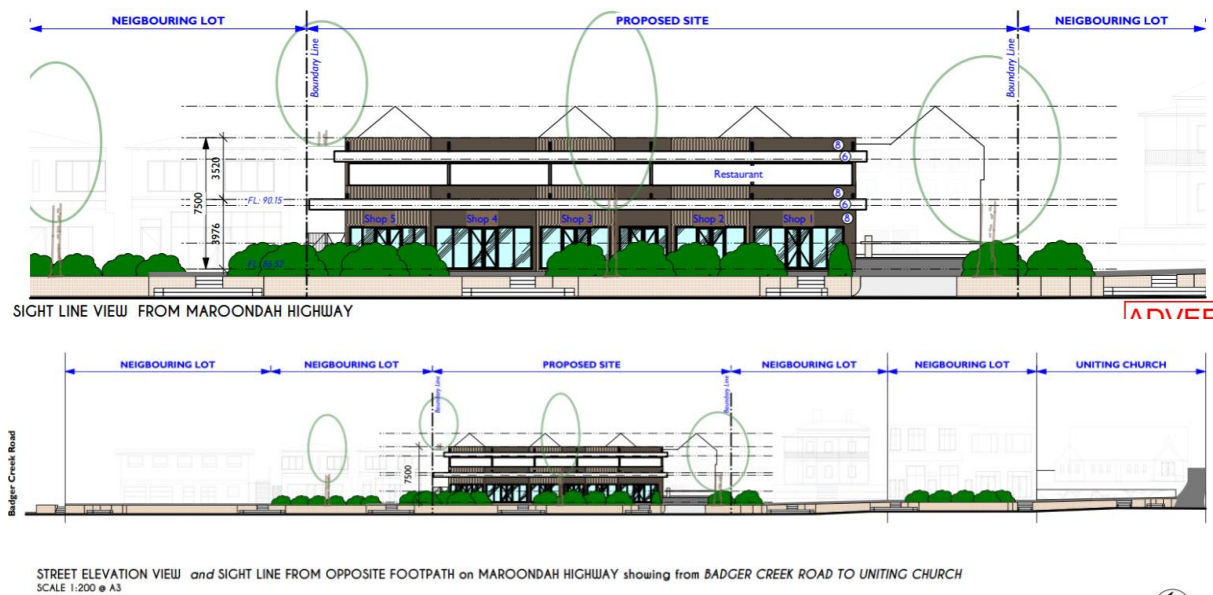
Proposed Streetscape from Maroondah Highway vantage point
